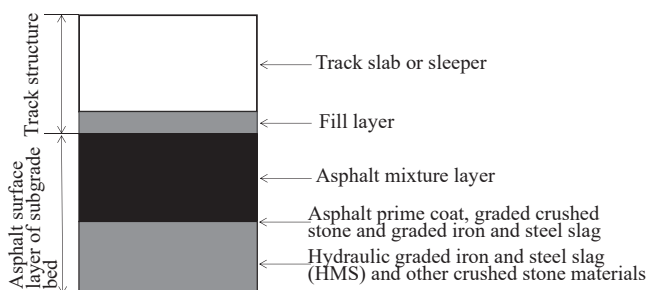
Longitudinal section structure of asphalt surface layer of subgrade bed for ballastless tracks in Japan
